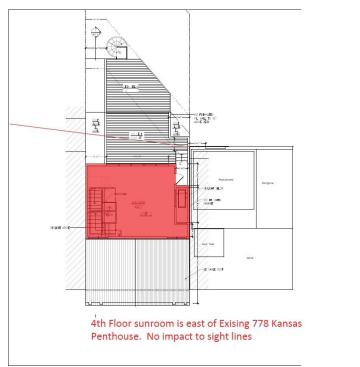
Proposed Third Floor Plan and Code Compliant Configuration with Sightlines from 778 Kansas
